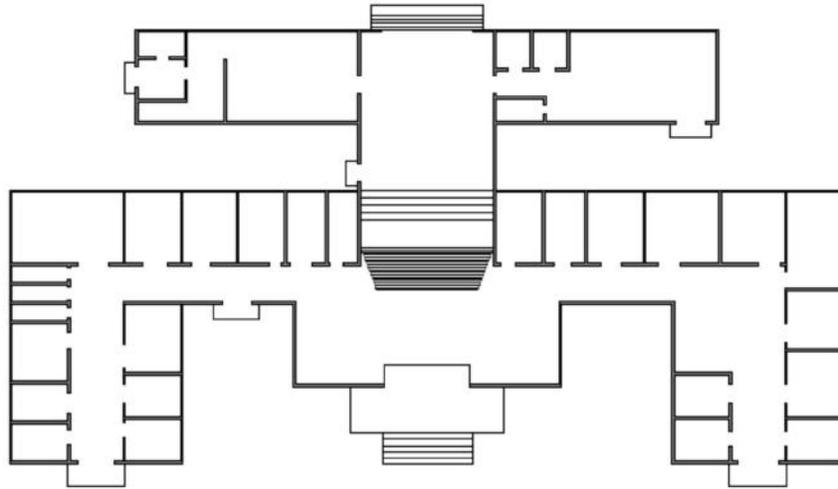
Typical floor plan for a precast RC school building (School #32, Bishkek).
